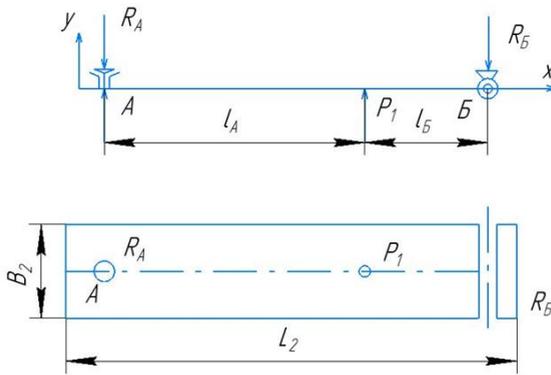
Design model of a rigid floor beam with a double-hinged connection
